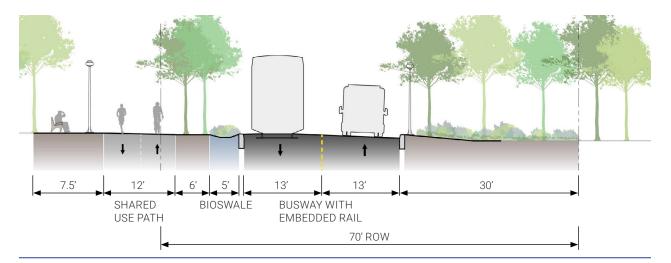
EAST OF US 1 CROSS SECTION FOR ALTERNATIVE 1 (DEDICATED TRANSIT ROADWAY WITH LIGHT RAIL)
